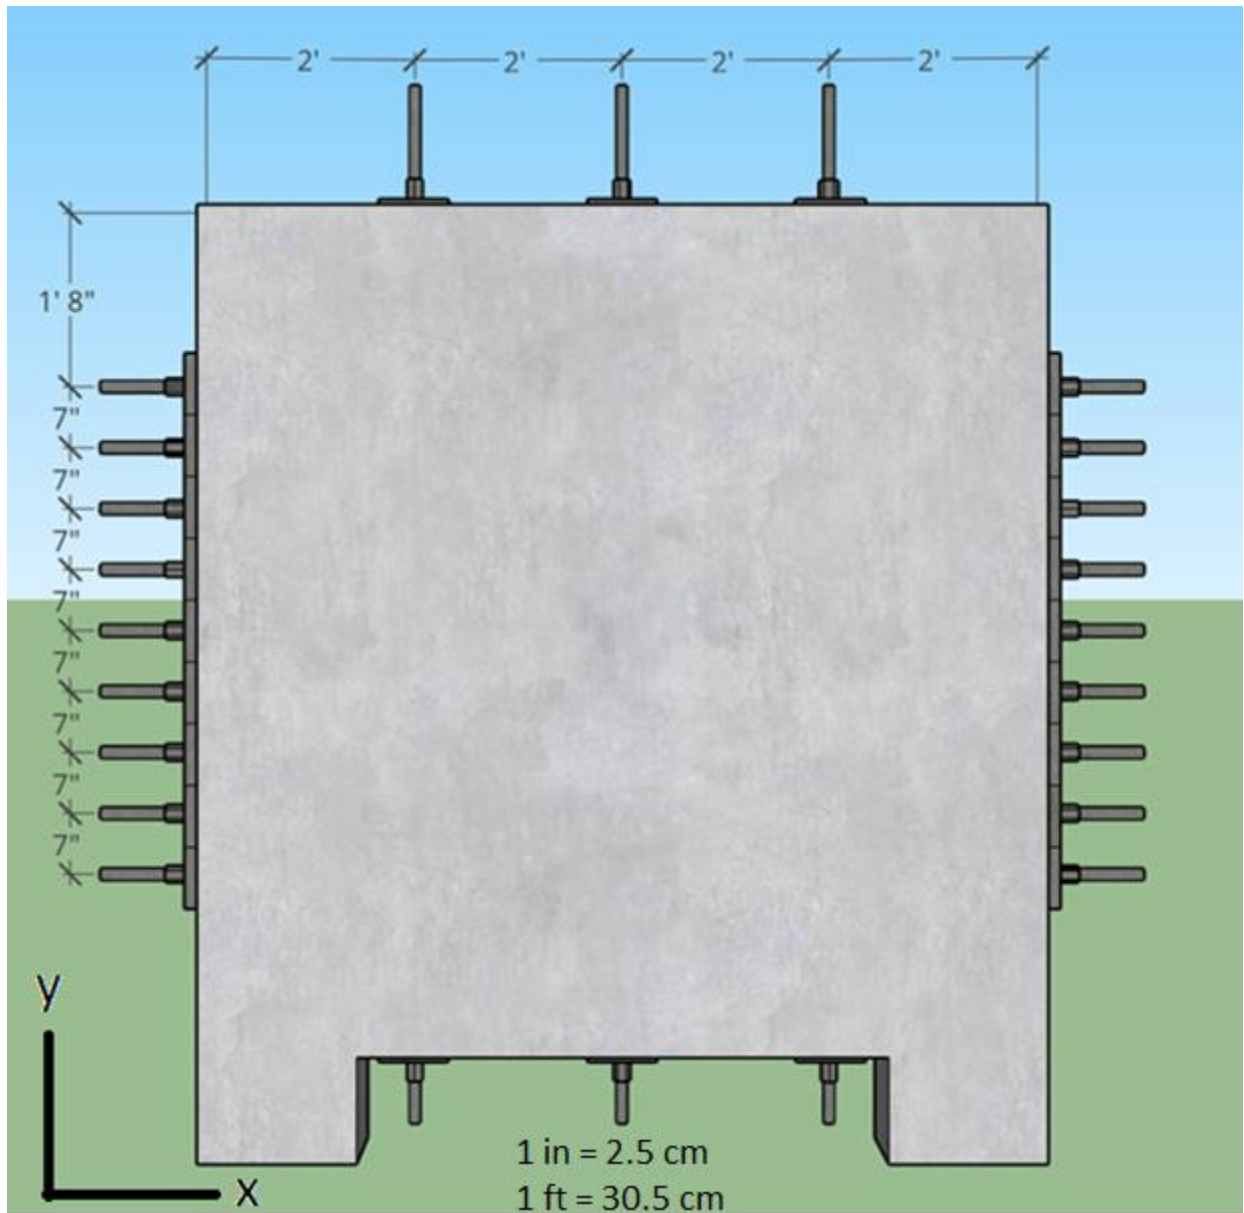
Specimen 1-Post-Tension Bar Layout Elevation View
